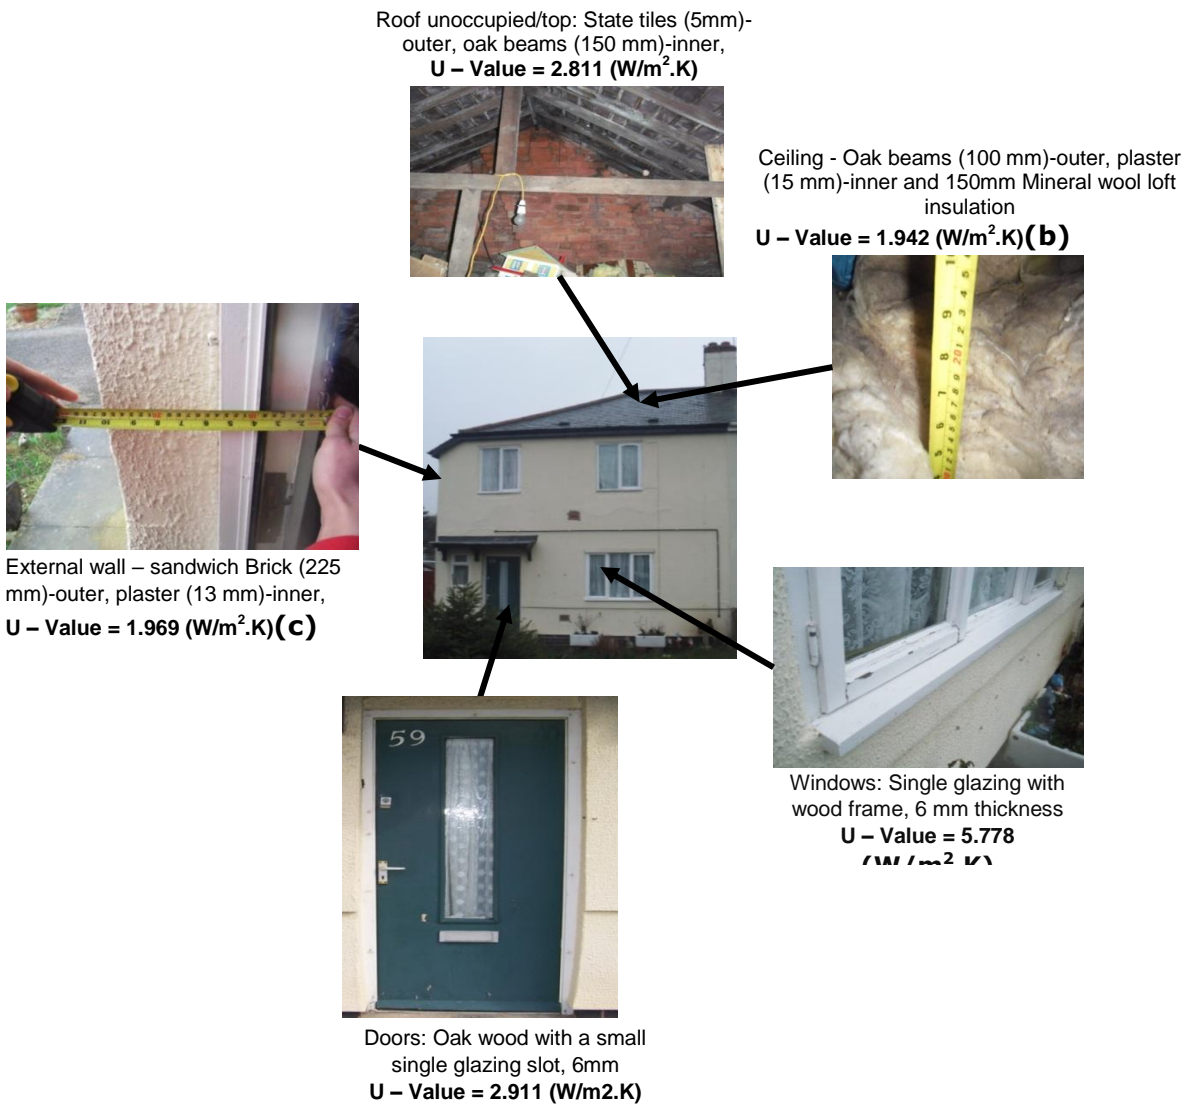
Front and rear architectural façade details of the Bilsthorpe houses (5- 6)
